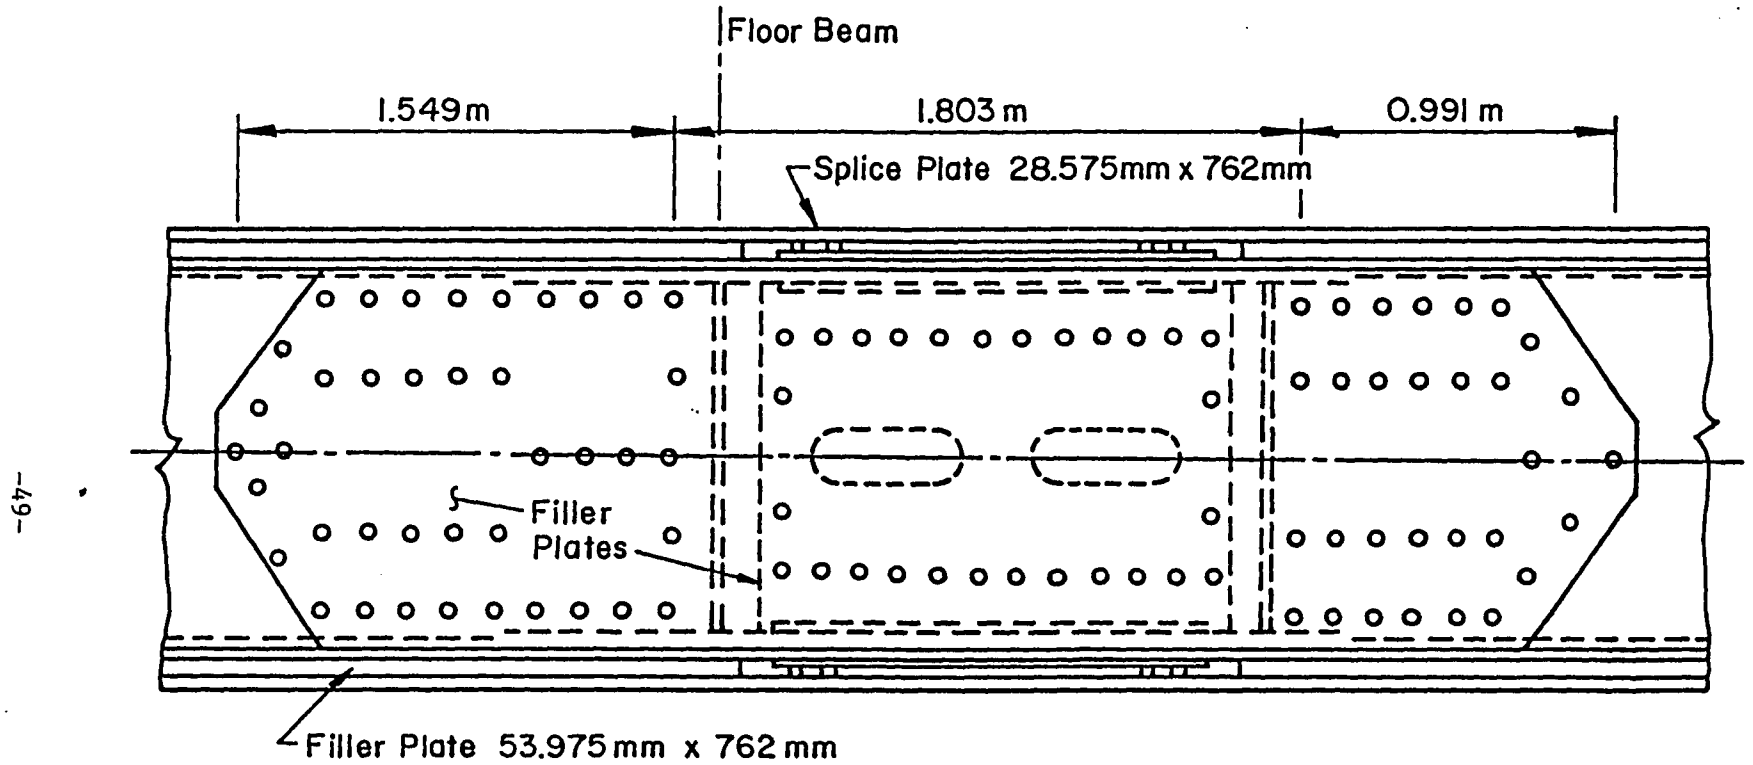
Plan of the Typical Retrofit Detail for Spliced Panel Points on the Tie Girder
